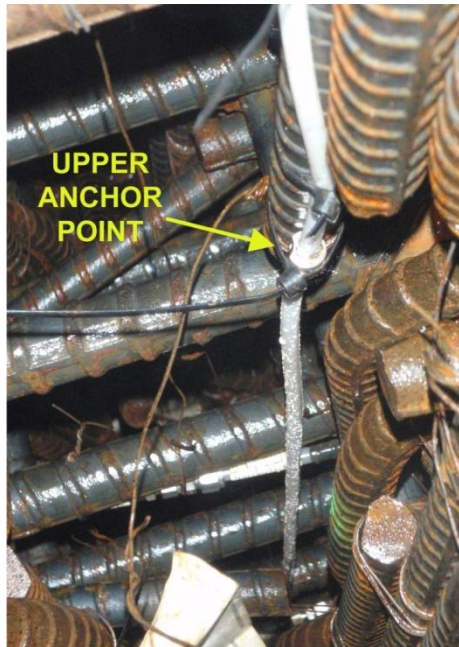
Vertical deformation sensor anchor point on lower concrete component rebar (AECL stock photograph)
